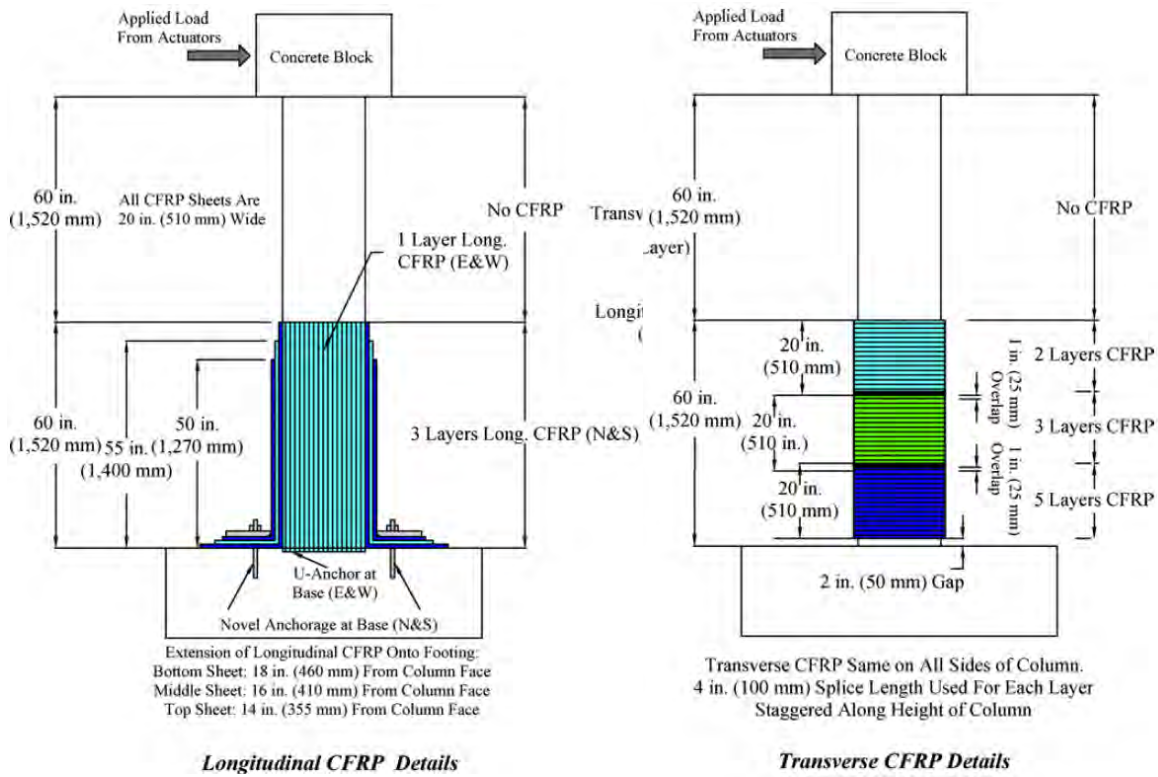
Elevation of the column retrofitted with longitudinal CFRP and CFRP jacket. (He, 2013)
